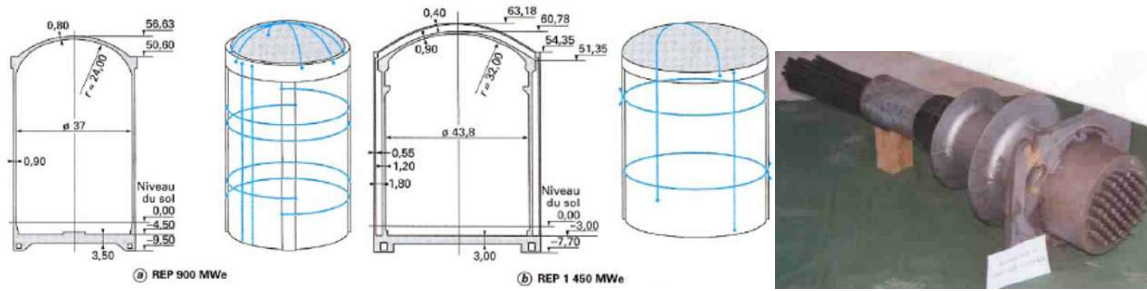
Main dimensions of French 900 MW and 1300MW-1450 MW Pre stressed containments (left) - photo of pre stressing cables and anchorage head (right)
